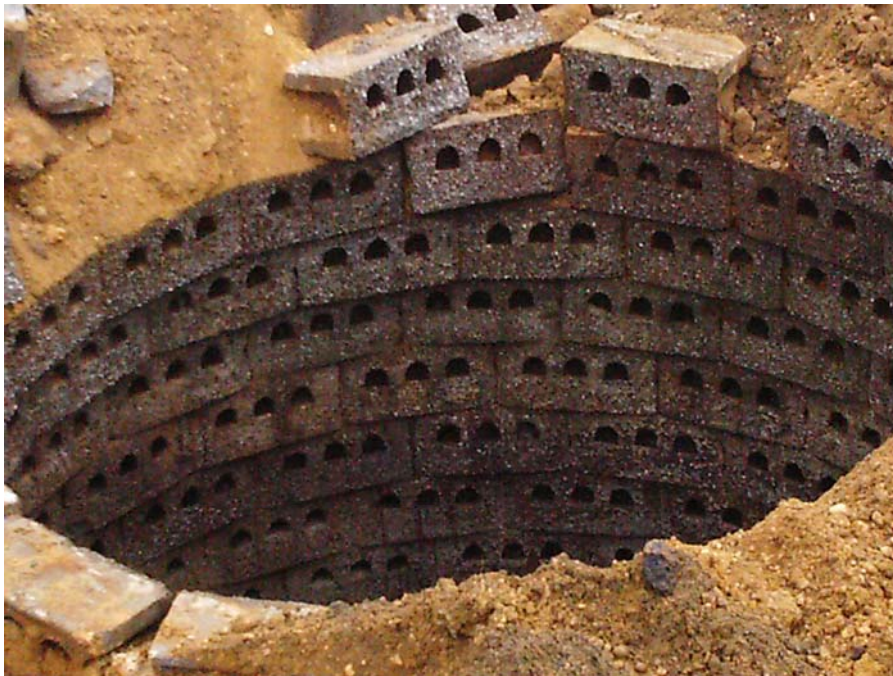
view of excavation around UK-55 (looking south) to allow evaluation prior to removal .
